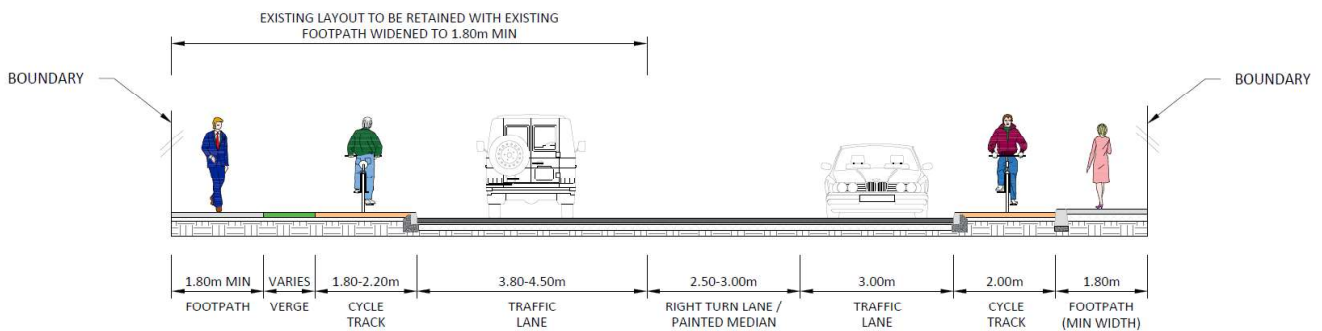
South of Longfield Avenue - Typical Cross Section
